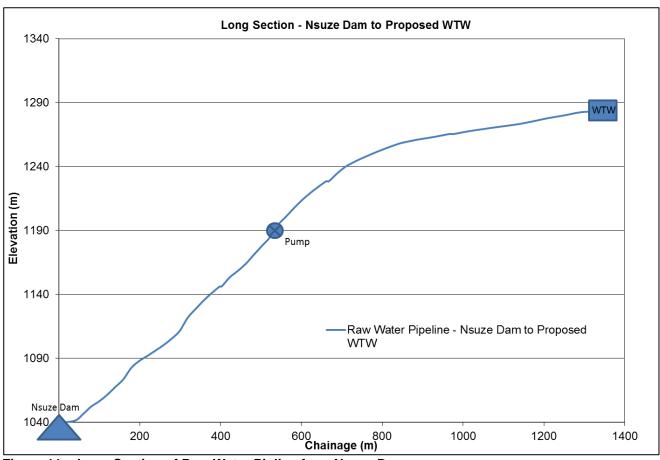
Long Section of Raw Water Pipline from Nsuze Dam
